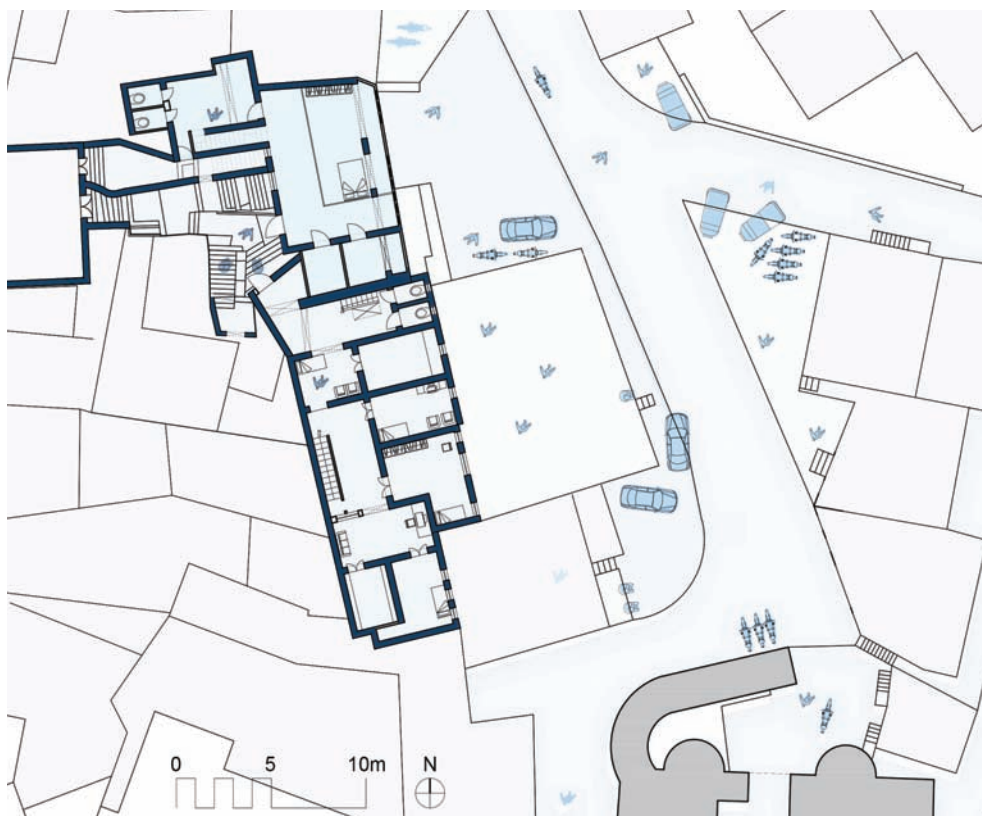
first floor plan of two havelis. As one enters it opens to an internal courtyard on one side and doors to enter the rooms on the other side. This floor is used as a living area for the family gatherings
